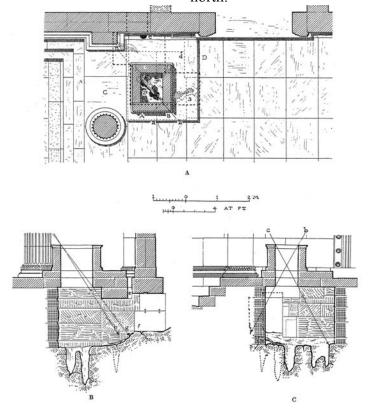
Floor opening and reconstruction of the altar of Thyechoos. A. Plan; B. Section looking east; C. Section looking south (after Stevens et al, 1927).
